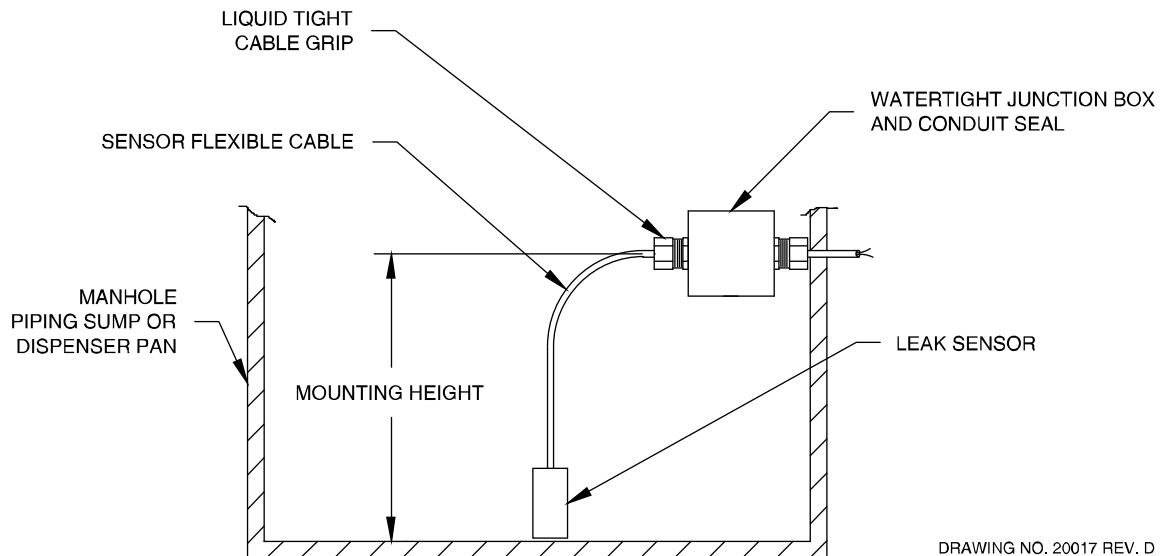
Leak Sensor Installation in Piping Sumps, Manholes, and Dispenser Pans
